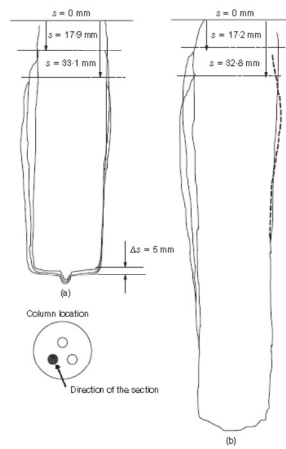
Outlines of sand columns during foundation loading process, circular footing (a) TS-01, column length 150mm; (b) column length 250 mm (McKelvey, 2004)
